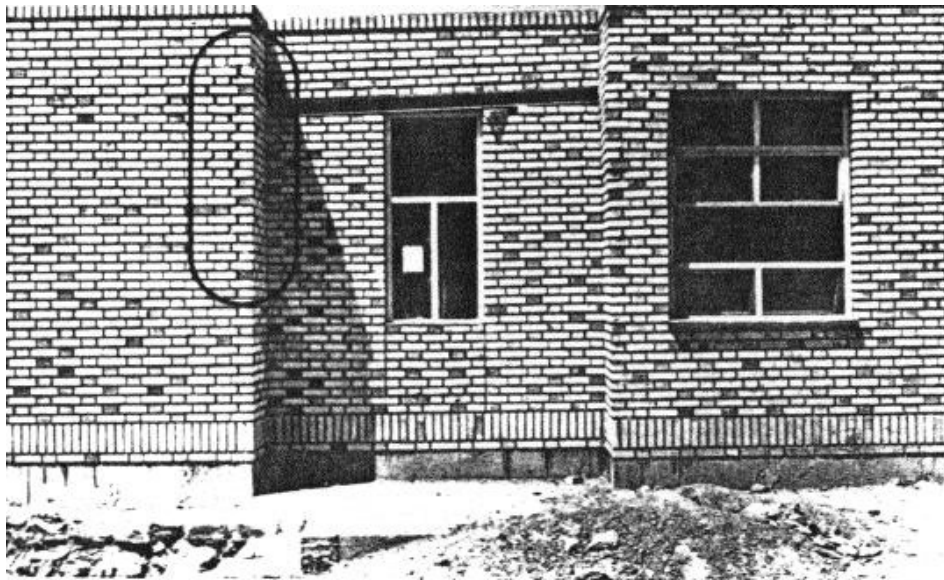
Commercial building with infill arches of plain masonry with versicle cracks resulting from out-of-place shear.
